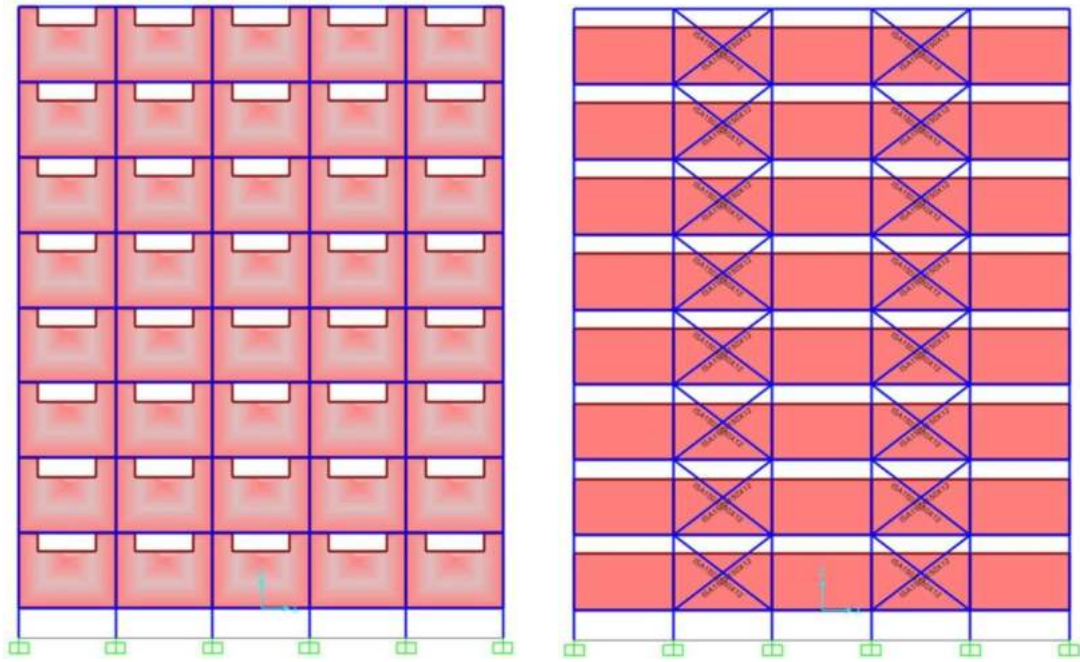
Elevation of 75% Partially in-filled frame with additional in-fills adjoining the column
